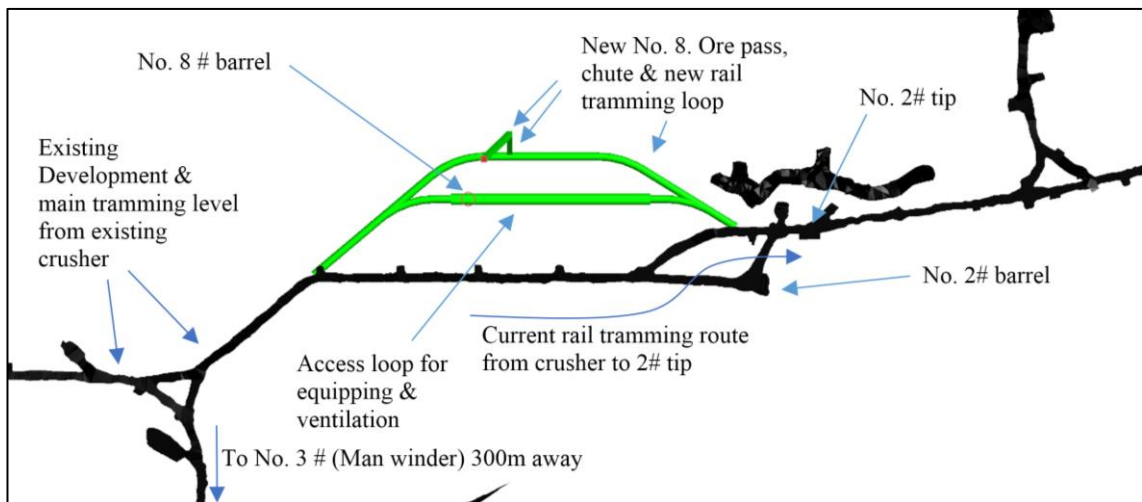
Plan view of 2350L showing the positions of the No. 8 shaft and new tramming loop
